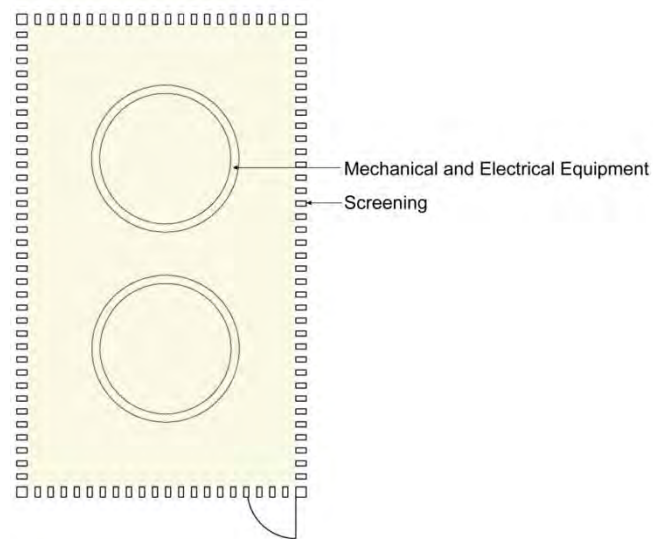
Screening for Mechanical and Electrical Equipment Plan.
